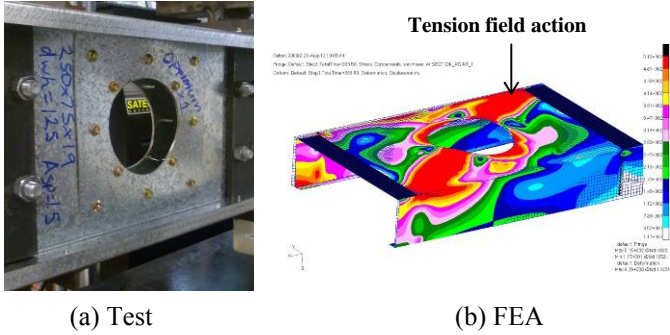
Failure mode of 250x75x15x1.9 LCB with 125mm stiffened web openings and 225x225x1.9 mm plate stiffeners (Test specimen 9).
